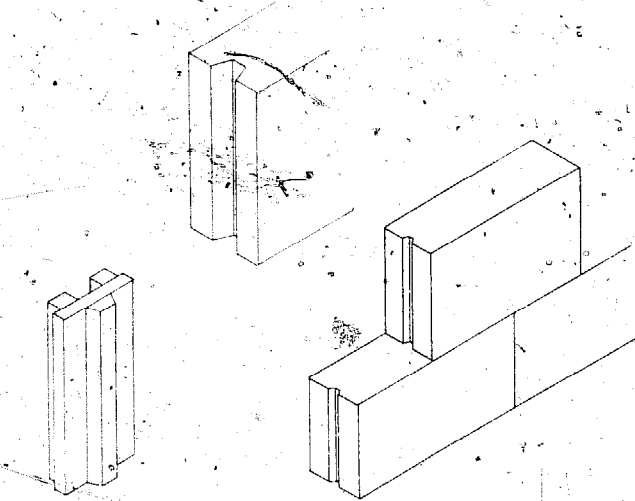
(a) Seams of monolithic walling are bonded and are tongued and grooved.
